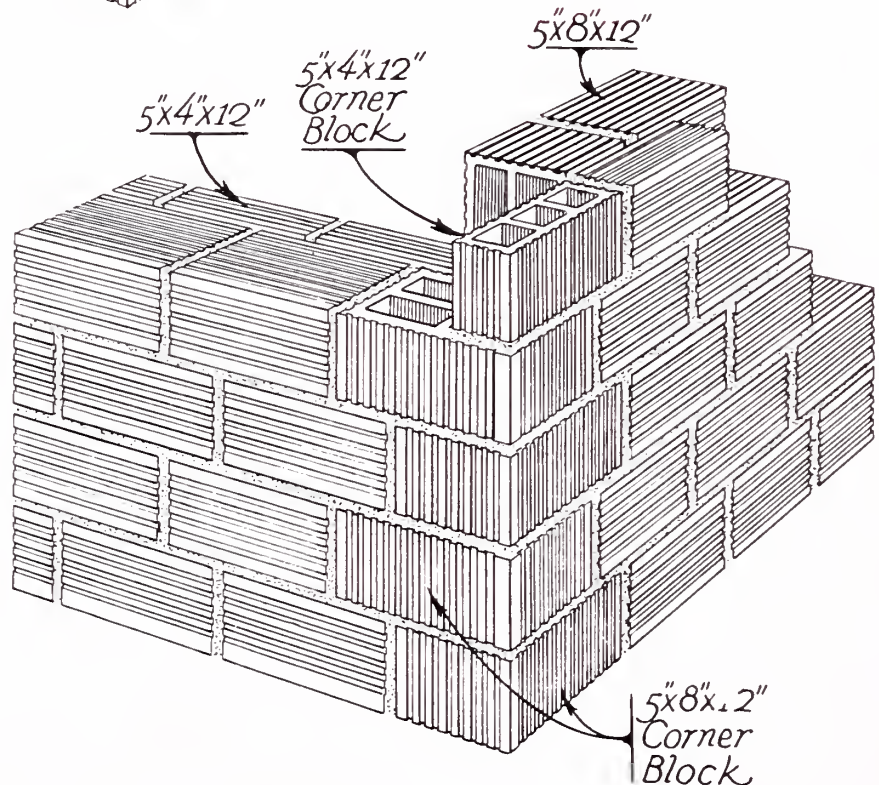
Section of twelve-inch load bearing wall constructed of standard 5"x8"x12" and 5"x4"x12" backup tile, alternating four-inch and eight-inch tile outside. 5"x4"x12" end blocks produce an 8"-12" break in joints.
